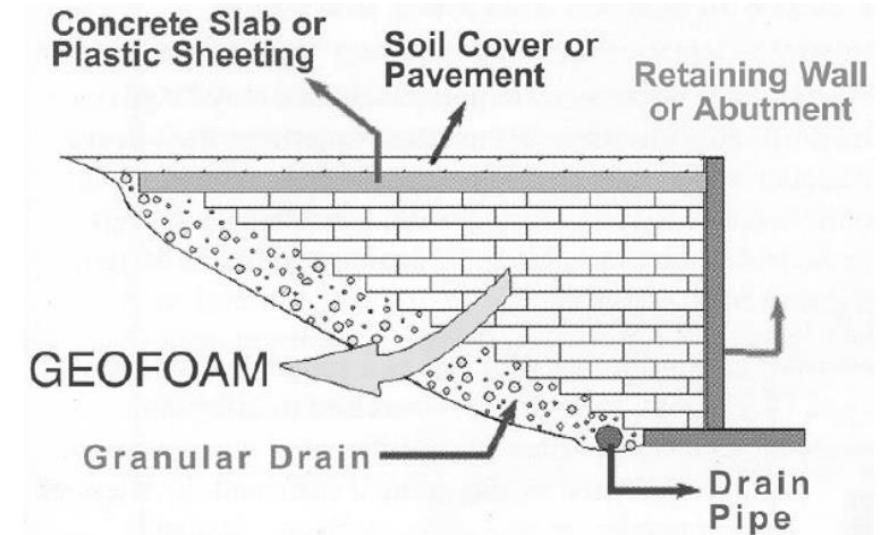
Typical Construction Detail for EPS GeoFoam Backfilled Earth Retention Structure (from Negussey 1997)
